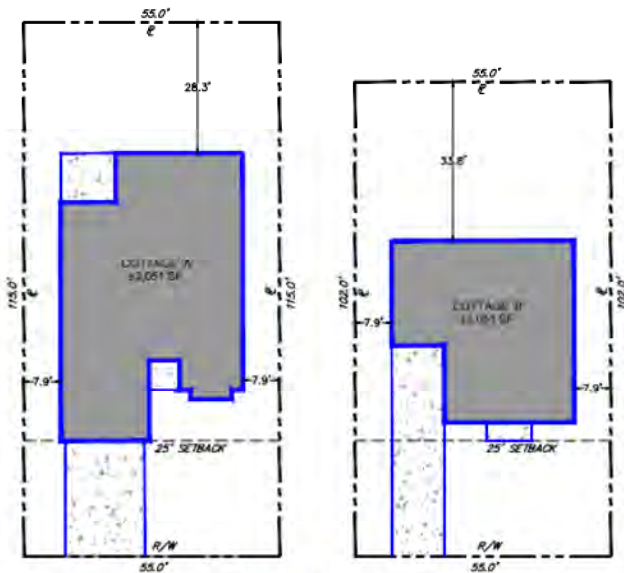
Smaller 'cottage' style floorplans of approximately 2,000 SF will be placed on the smaller single-family lots 1-96.
